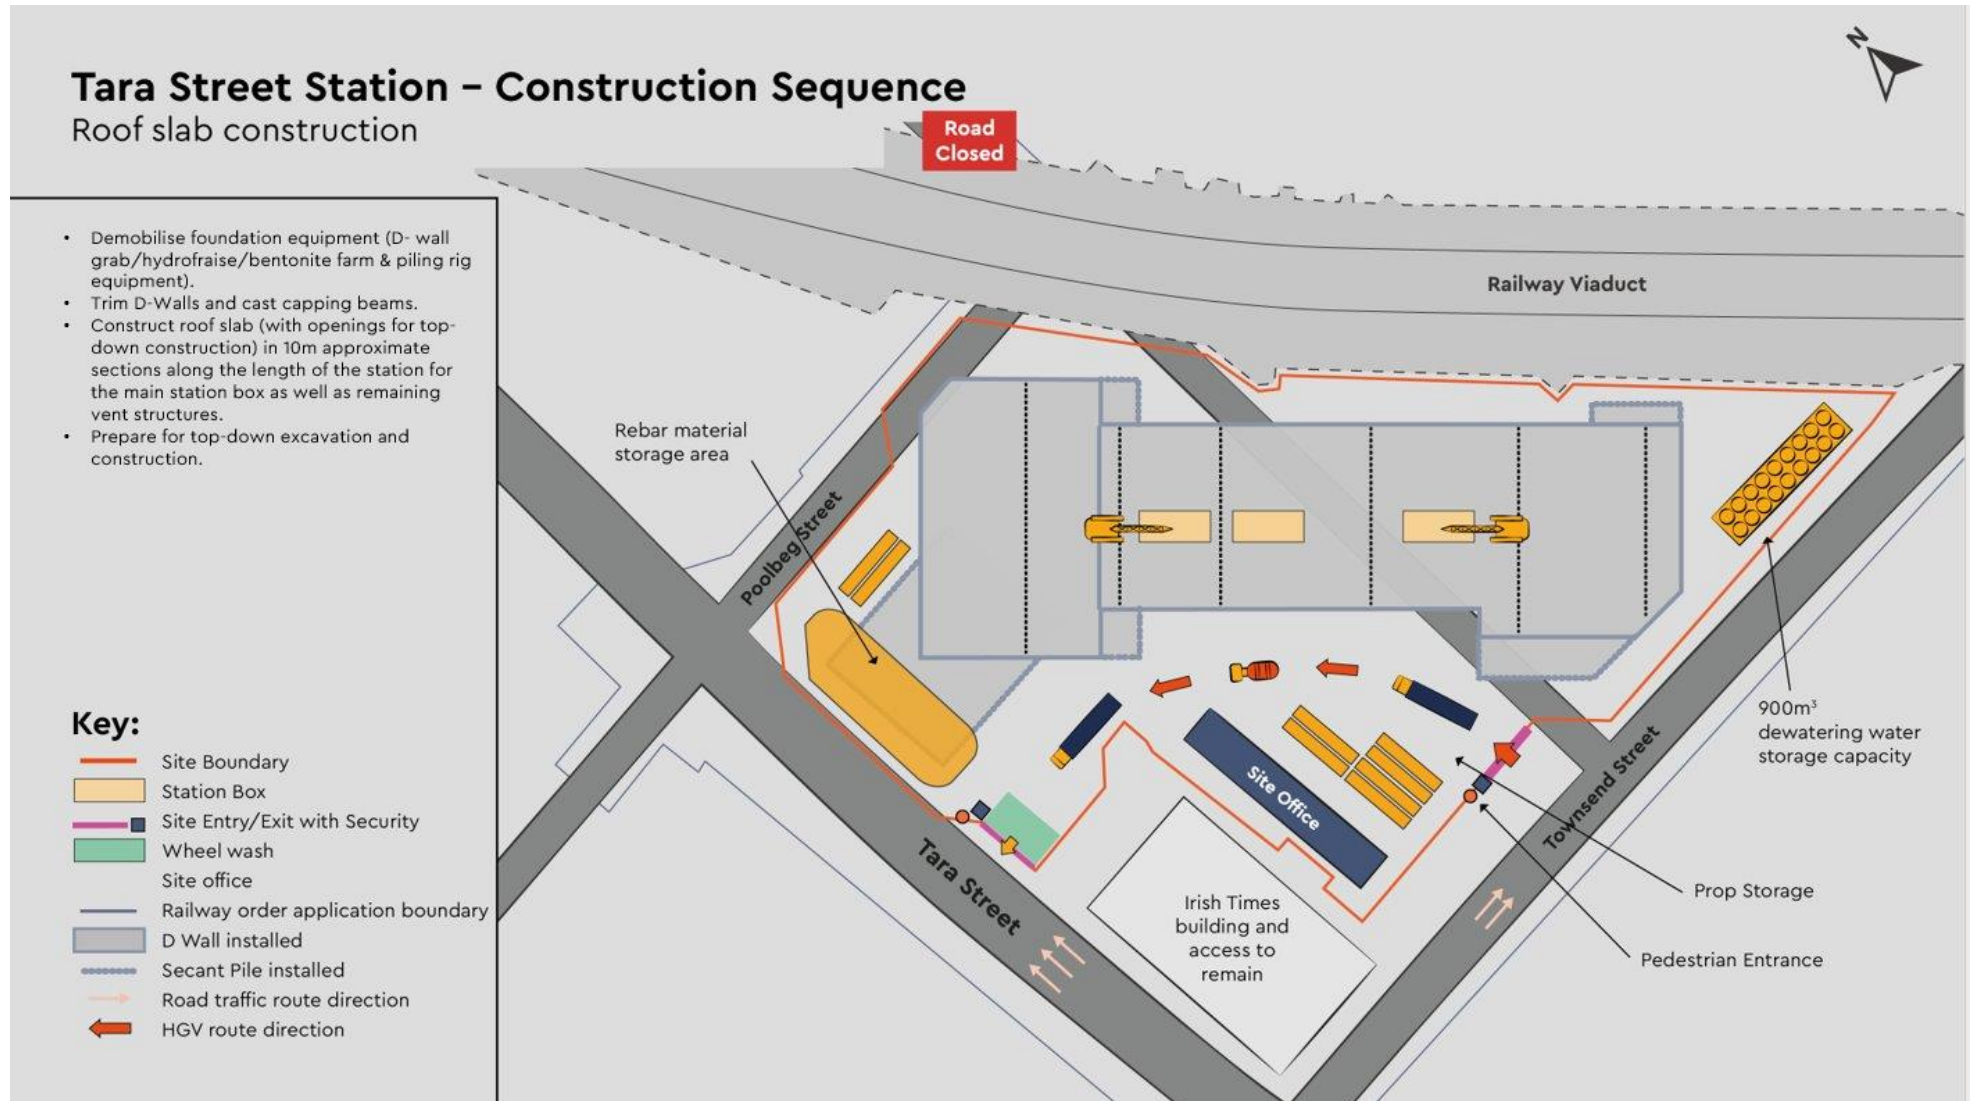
Tara Station Stage 3 - Roof Slab Construction
